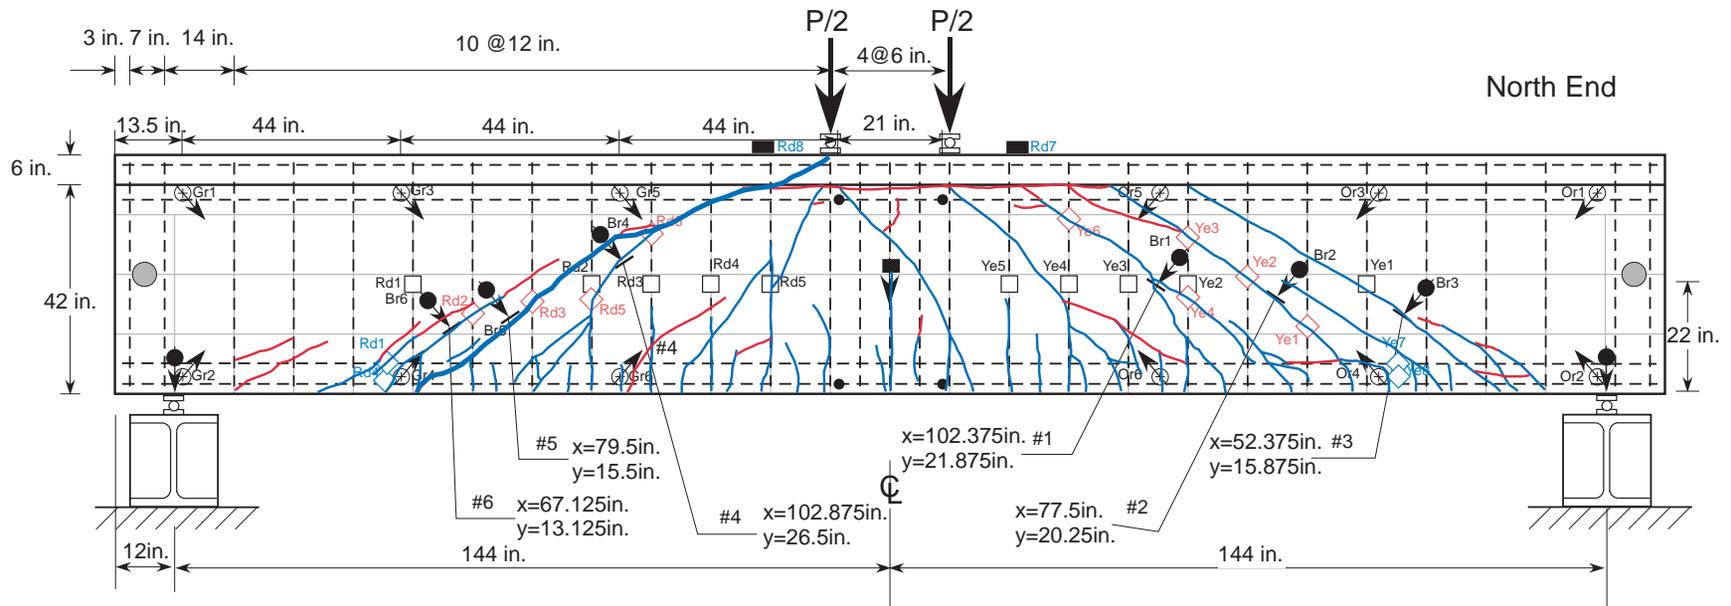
Instrumentation plan and crack pattern for specimen 9IT12-B1.
